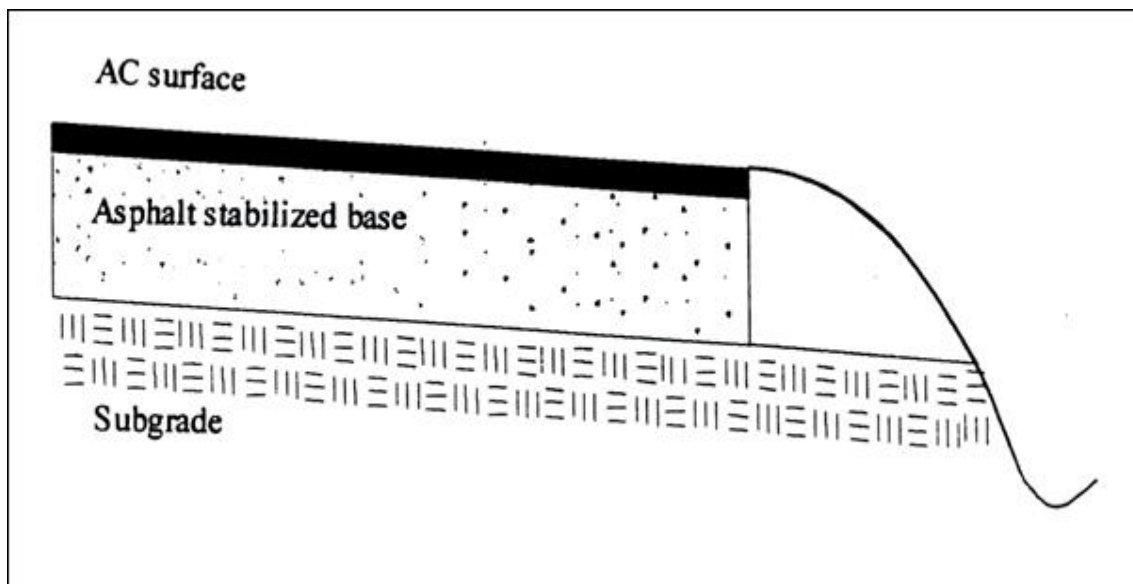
Typical full-depth asphalt concrete pavement (ERES, 1999).
